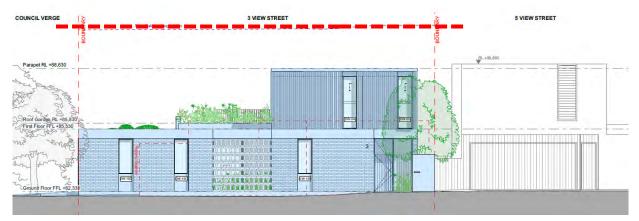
Proposed eastern (View Street) elevation (8.5m building height development standard shown in red dash line).
